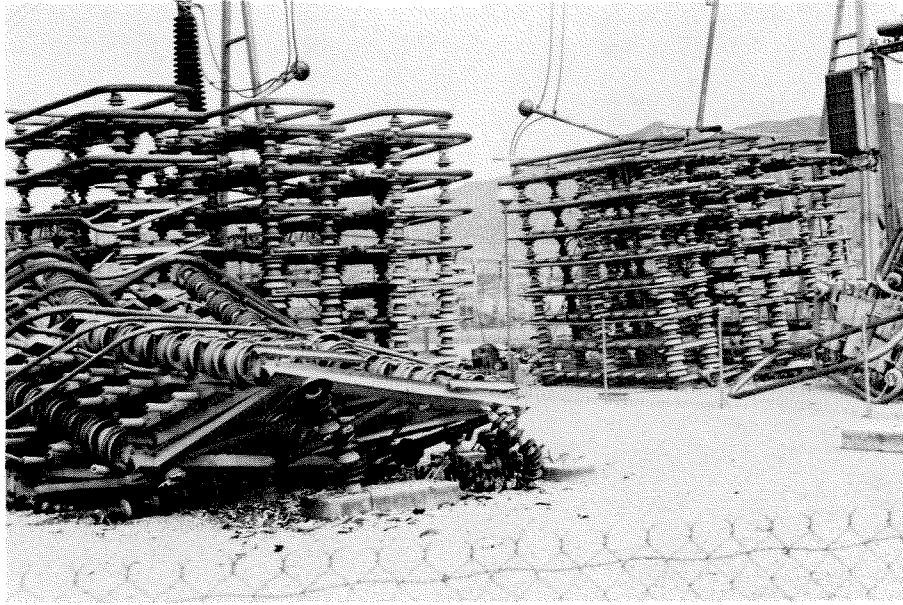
15 Damaged capacitor stacks in yard north of service and equipment building, Sylmar Converter Station
